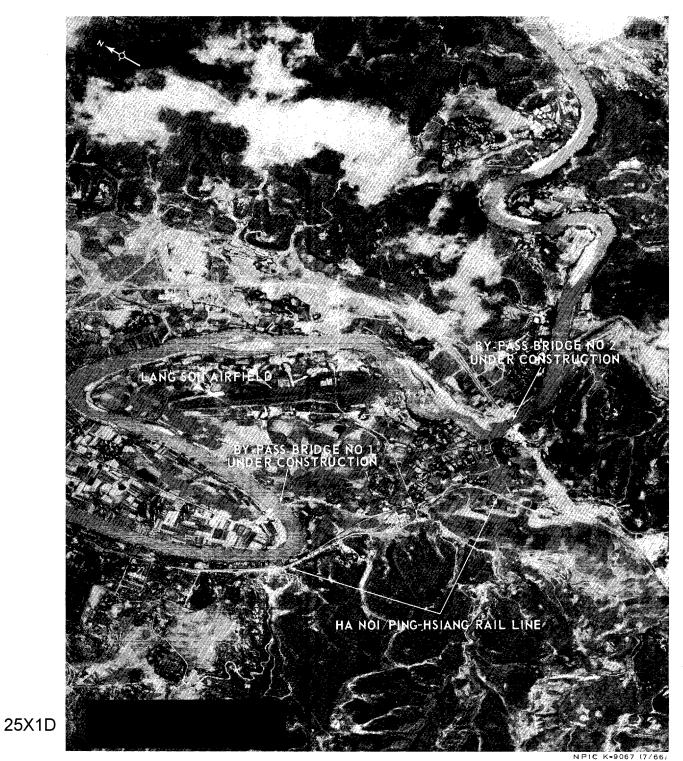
RAILROAD BY-PASS BRIDGE UNDER CONSTRUCTION, HA NOI/PING-HSIANG RAIL LINE, NORTH VIETNAM
